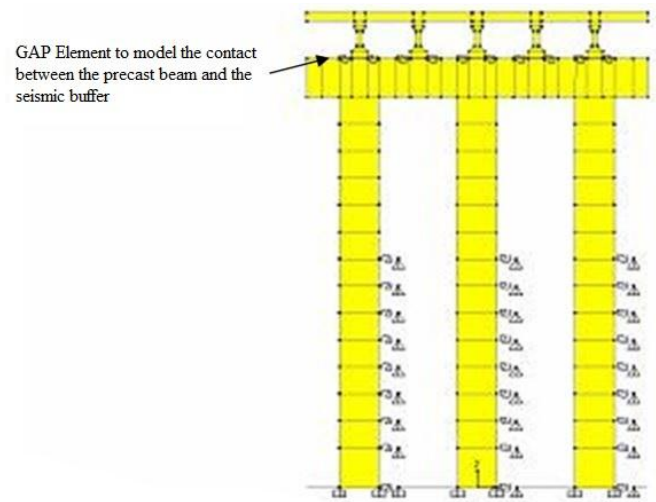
Model for Finite Element of the Bridge. Pile, Cross Beam, Precast beams and the Deck observed.
